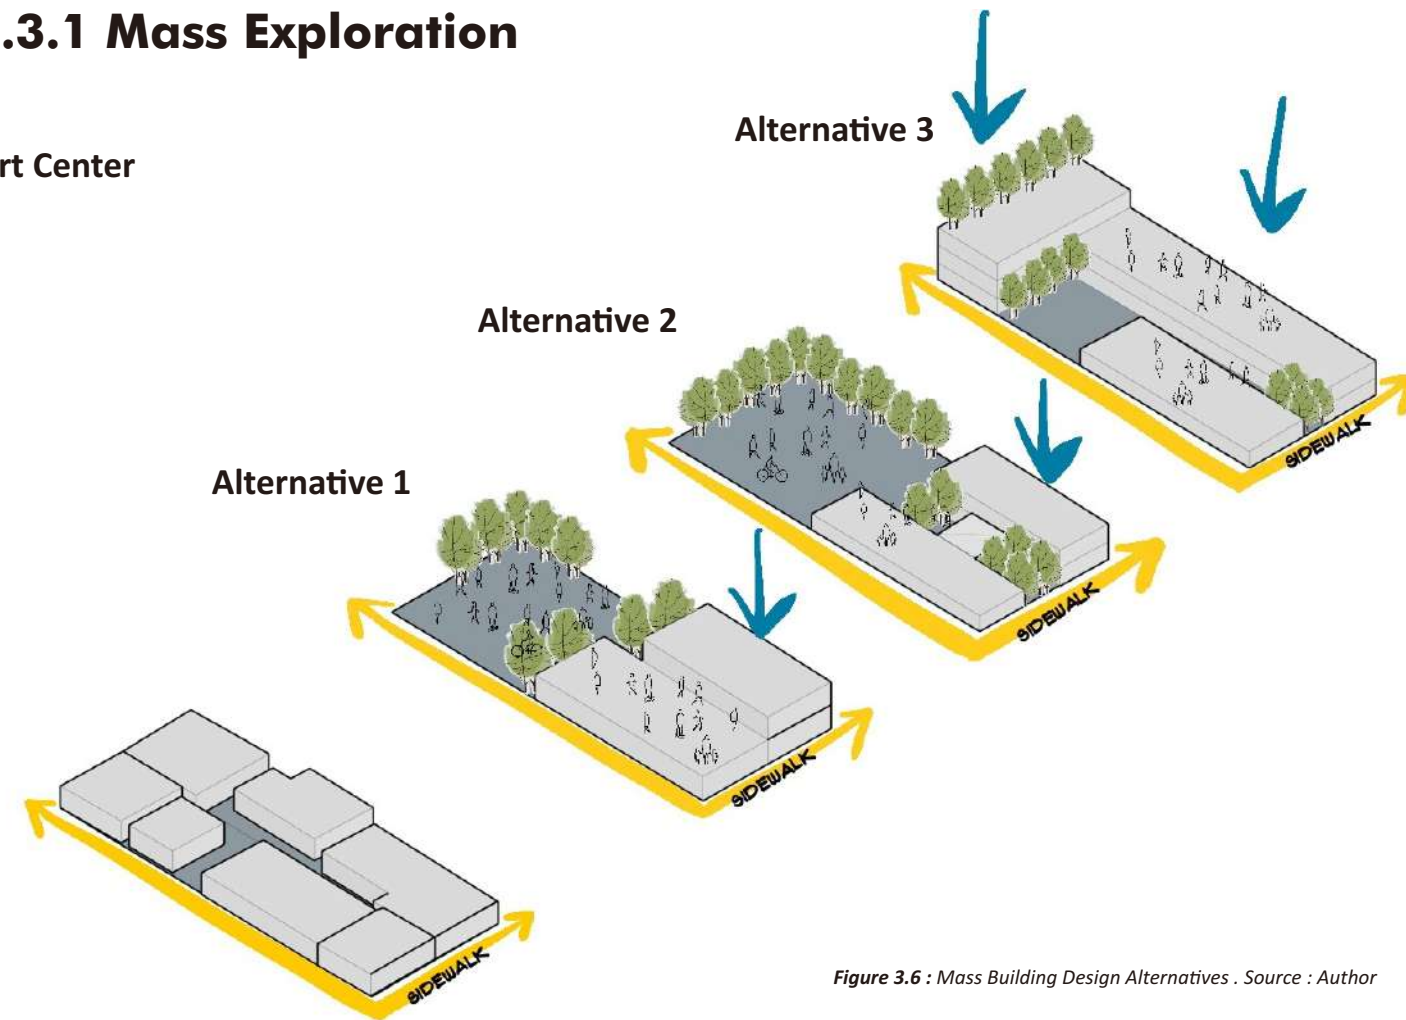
Mass Building Design Alternatives . Source : Author
